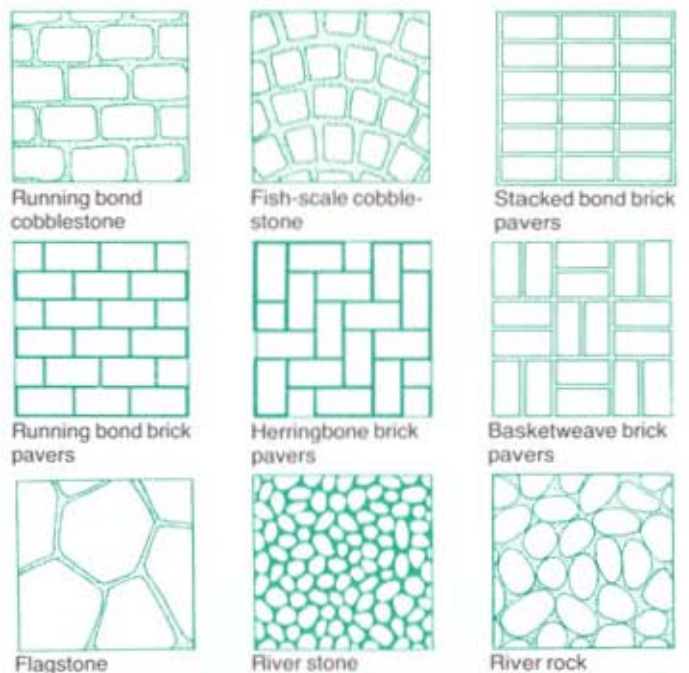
Typical paving patterns and other hard-surface treatments. Normal building brick will not survive if it is used as an outdoor pavement; the brick pavers shown here are hardened for outdoor use.
